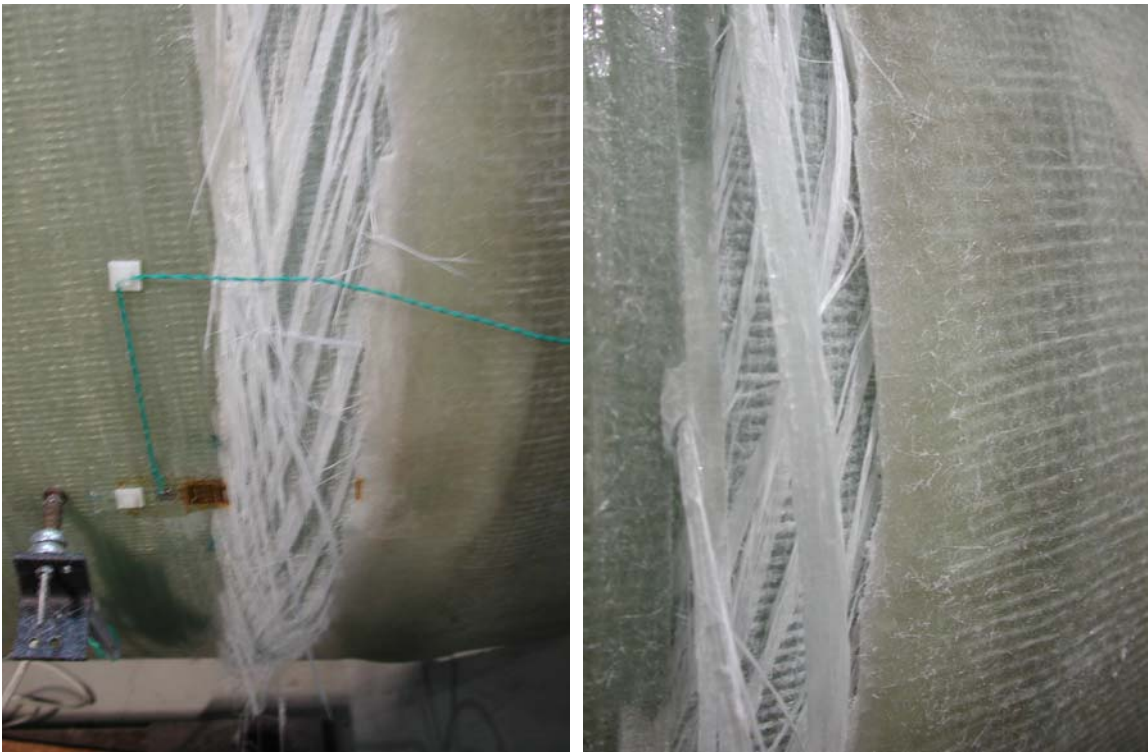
Detail of intermediate joint failure taken from outside on tensile face.
